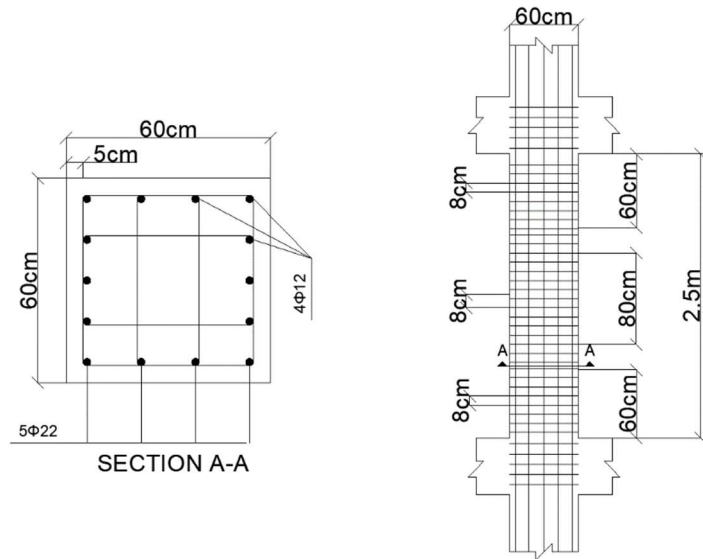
The section and reinforcement detailing of Type 1 column in the design
